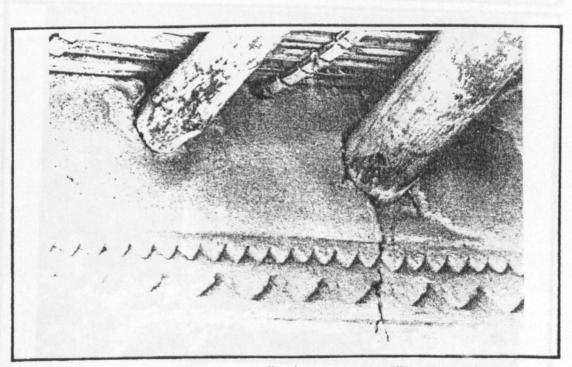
A photograph showing "al chandel wood" trunks carrying the roof, and the "salhah dakheliah" on an internal wall (15).
